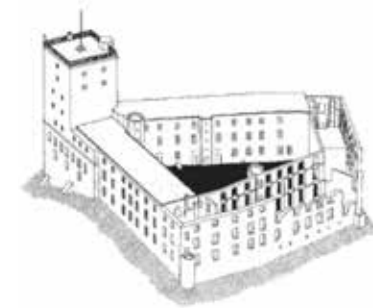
Koldinghus castle renovation by Inger & Johannes Exner, Steps of Renovation
